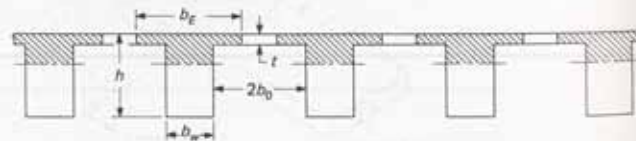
Effective section in compression of a T-section in a floor system.
